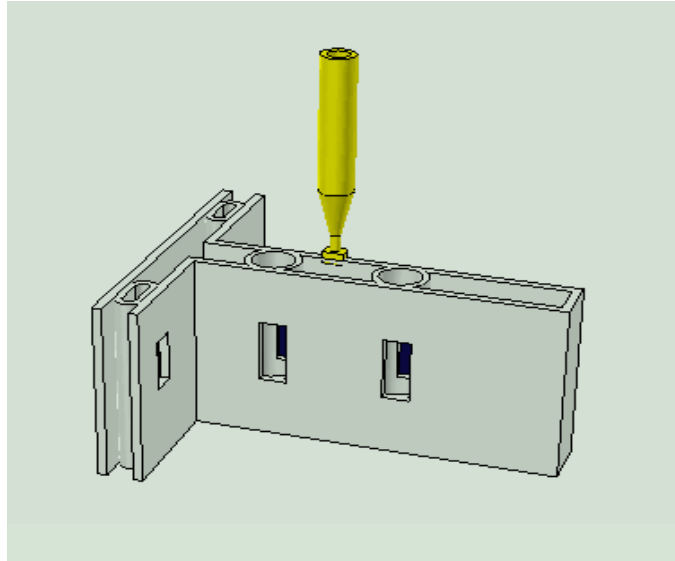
Imbedding electrical and plumbing conduit (Source: Khoshnevis-Japan paper)
